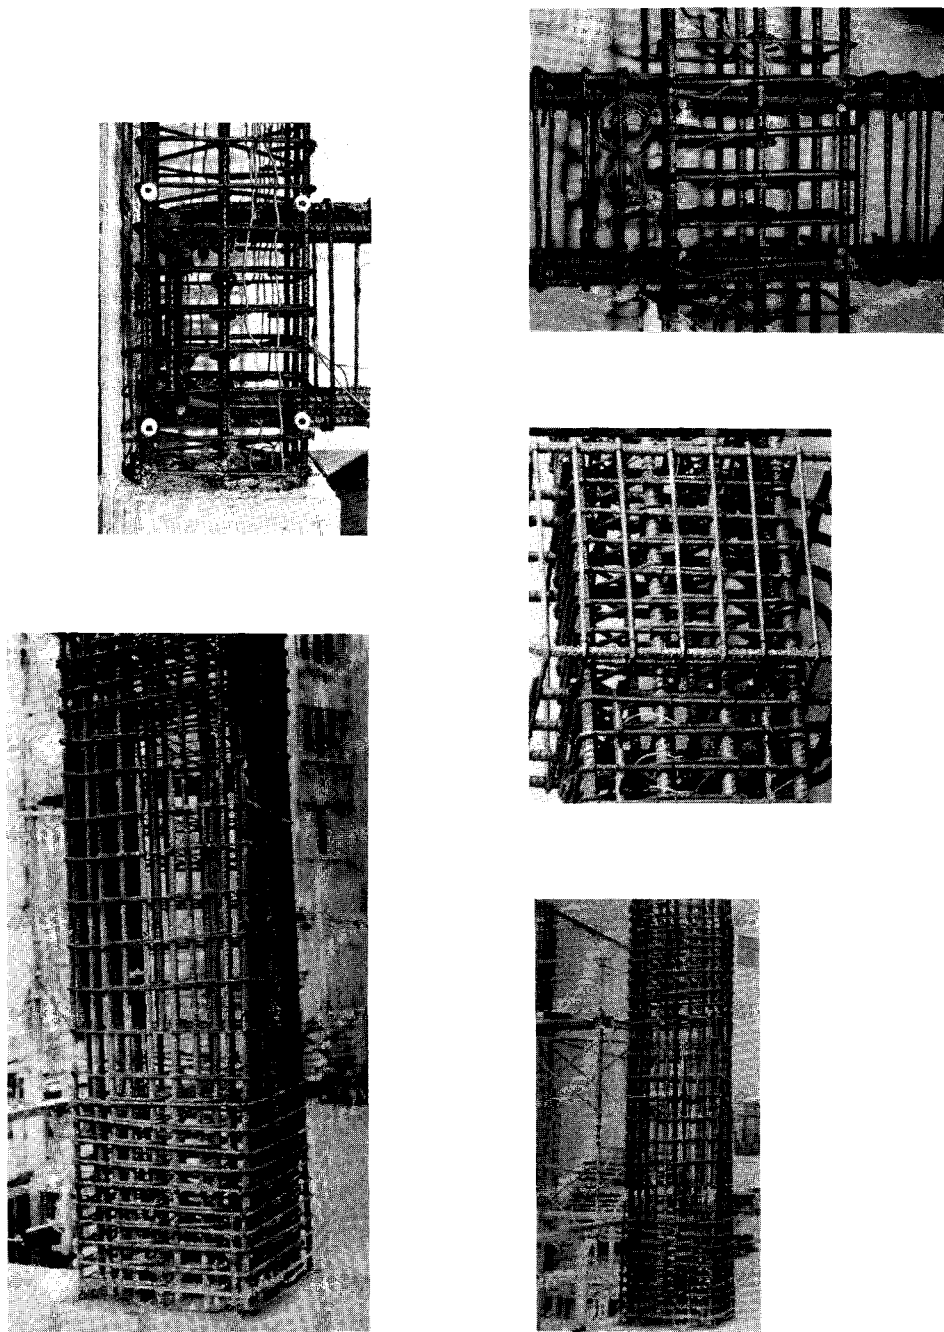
Some Reinforcement Arrangements for Ductile Reinforced Concrete Frames.
